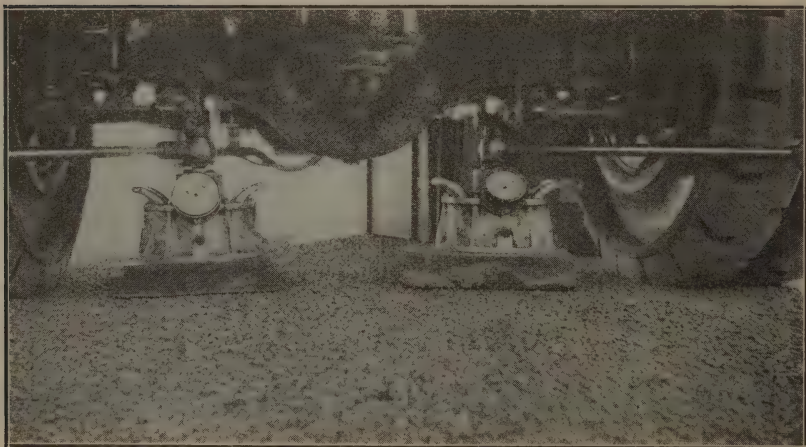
Plate XLV. State Highway, heavily loaded truck, loadometers under rear axle.
